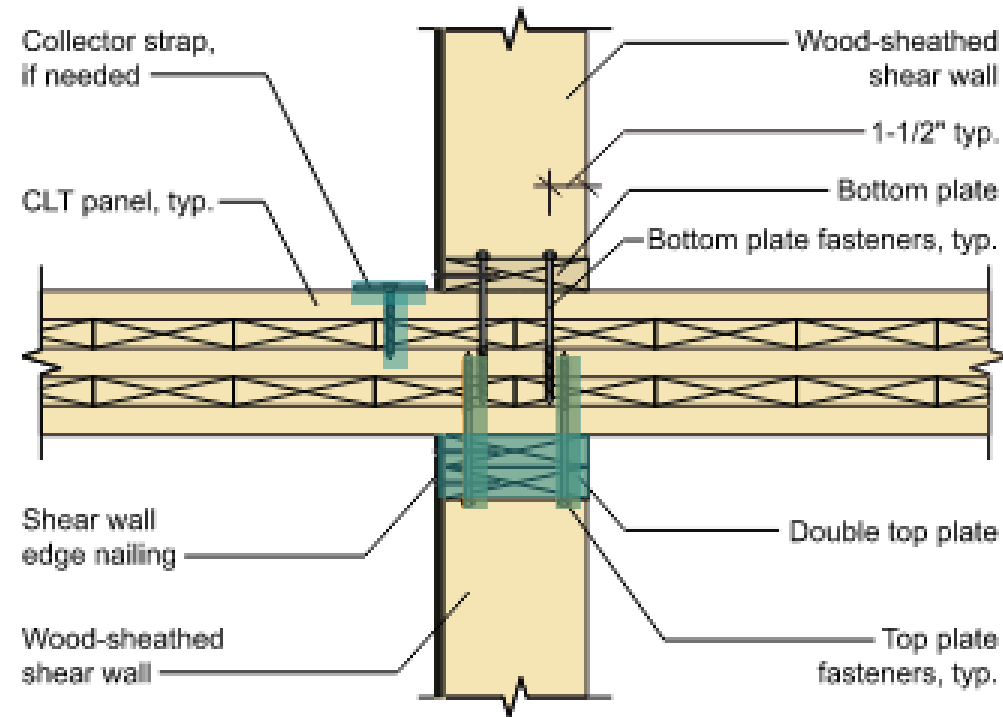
CLT to wood sheathed shear wall example detail
